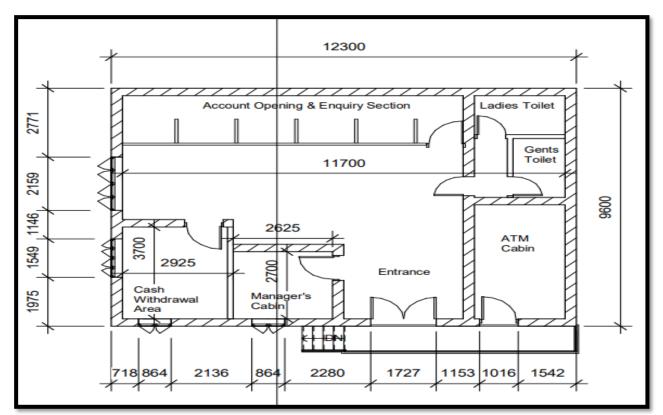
PLAN FOR MODAJ VILLAGE BANK
